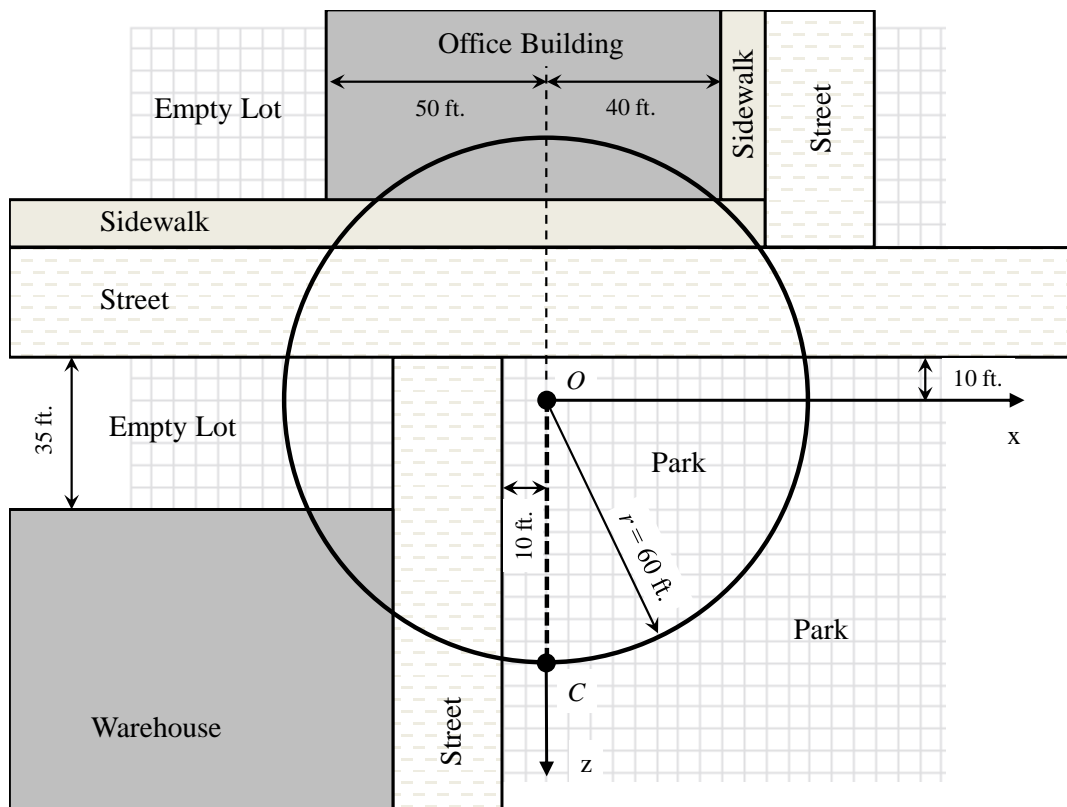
Plan view of the installation site, showing installed location of anchor bolt C and locations of office building, warehouse, streets and sidewalks. (Scale: 1 square is 5 ft.  $\times$  5 ft.)
